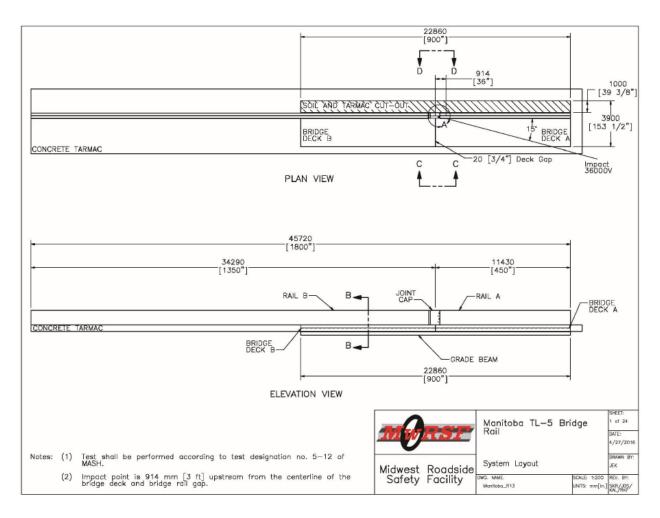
Test installation layout, Test No. MAN-1, reprinted from [15]
